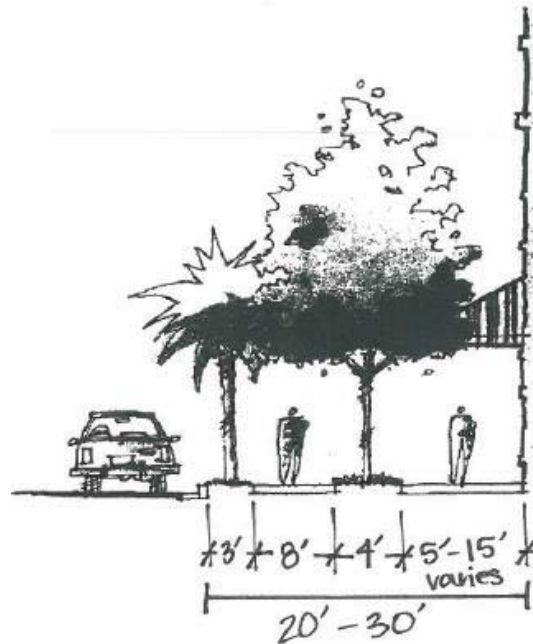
Sidewalk and landscaping cross-section for the boulevards.
